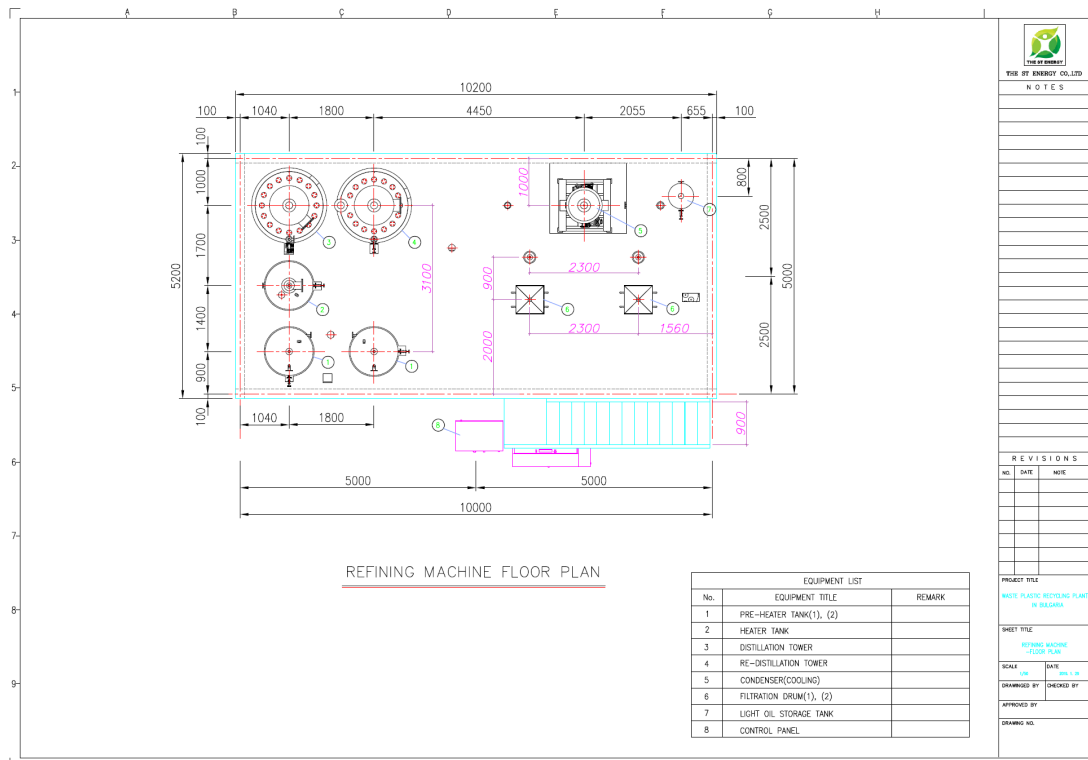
Floor Plan of Recycled Oil Refining Unit
